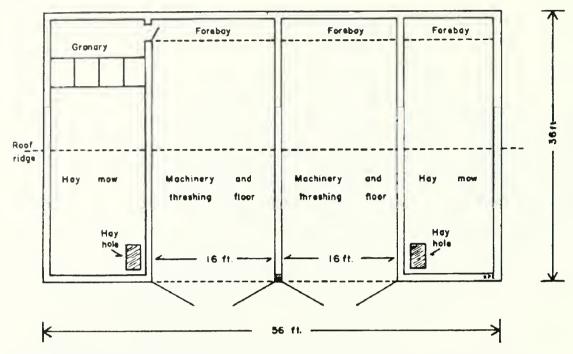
Typical upper levelfloor plan of a Standard Pennsylvania Barn. Note: the Mumma Barn differs slightly from this plan.
